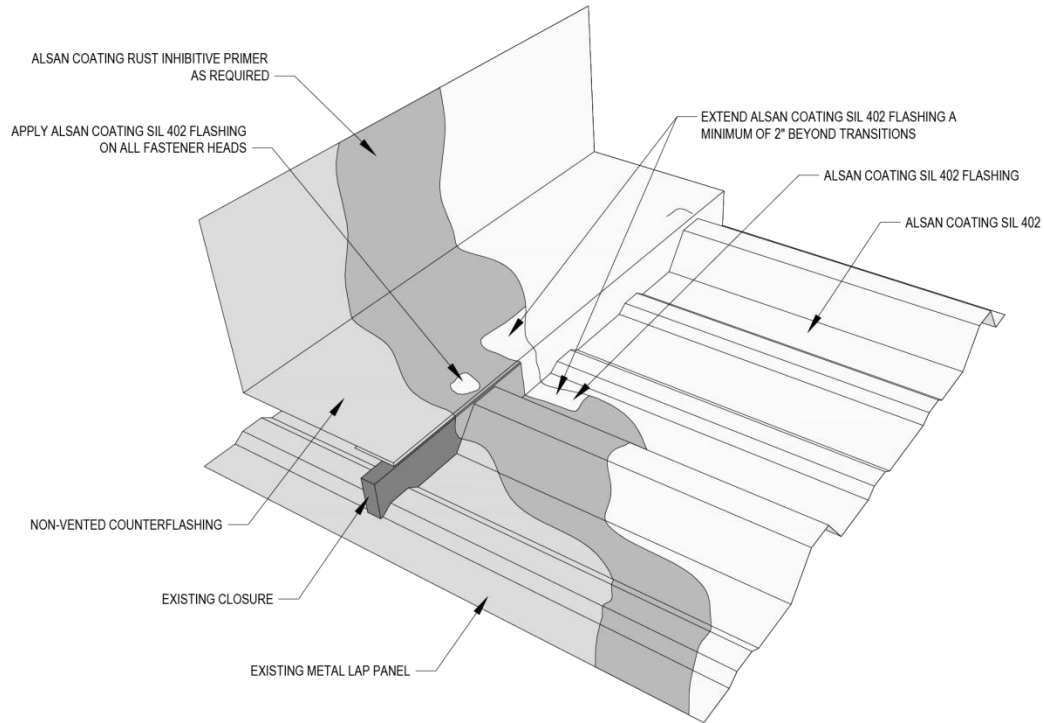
Silicone Roof Coating Over Metal Lap Panels, Wall/Curb
